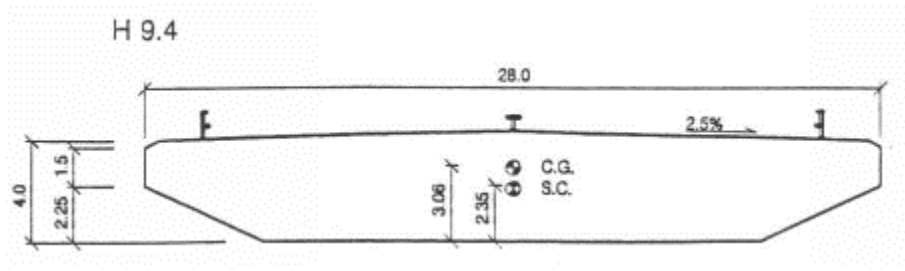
Alternative H9.4 deck section, suspension bridge, Storebælt East Bridge.
